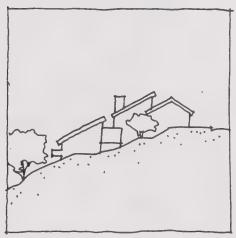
Use stepped, split level buildings to conform to steep slopes.
